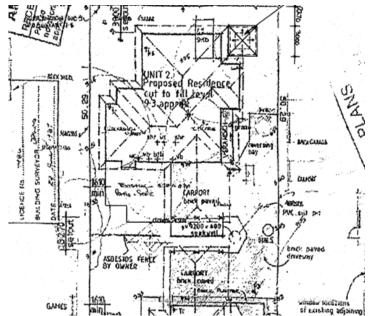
Plan of Adjoining Western Property Confirming That Subject Boundary Wall abuts an Adjoining Carport
